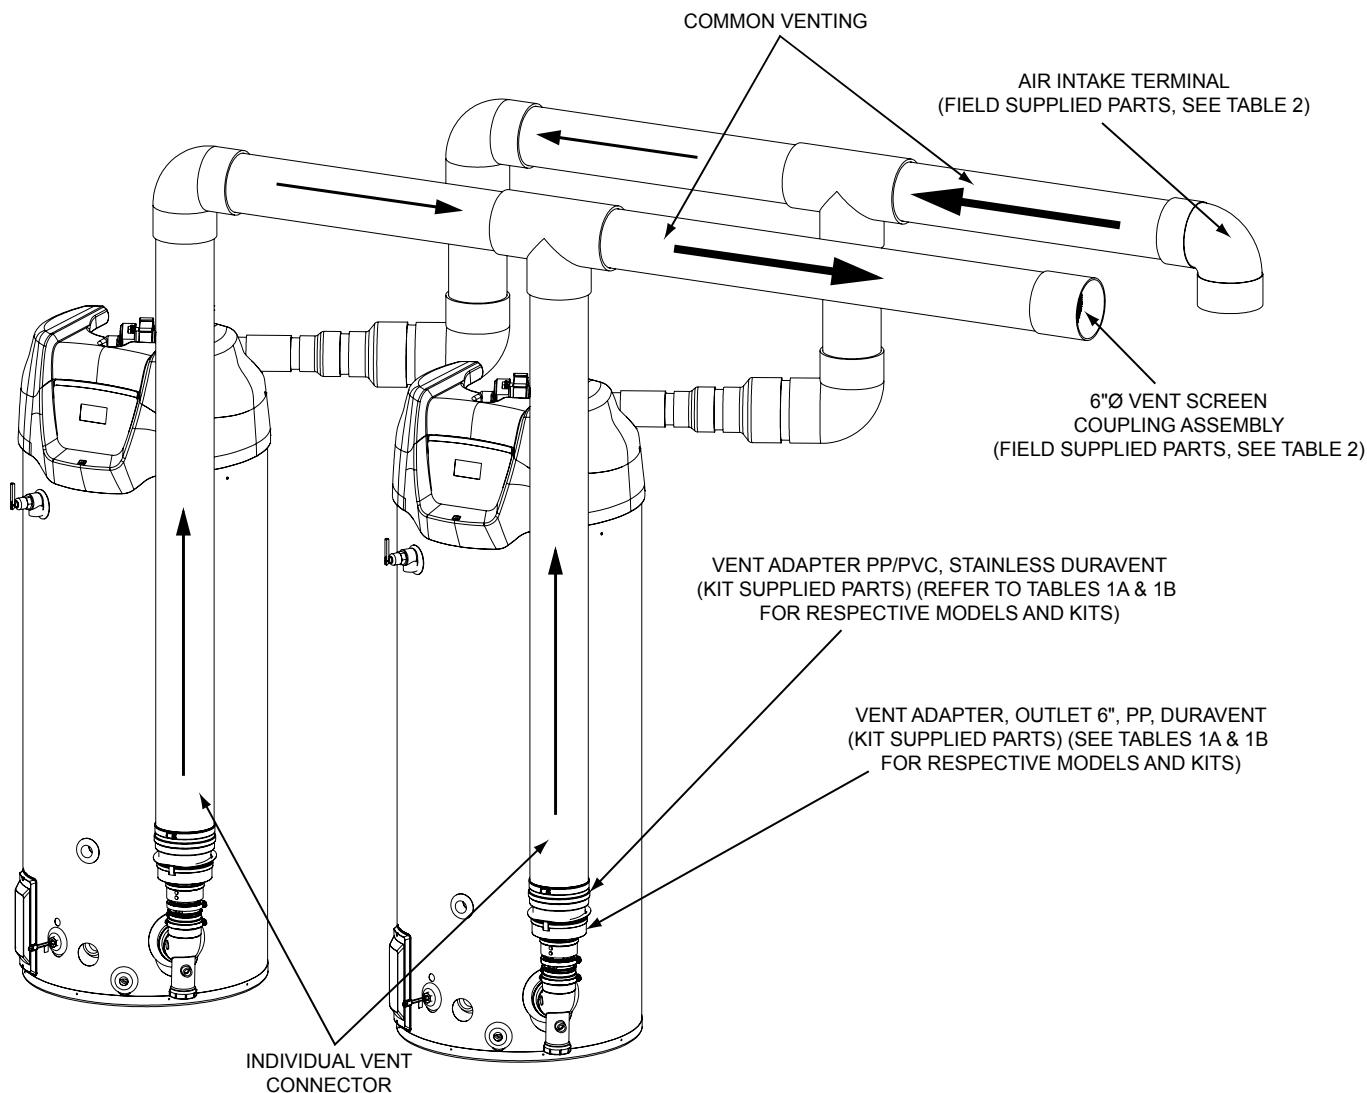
DEFINITION OF SYSTEM SECTIONS - PVC
